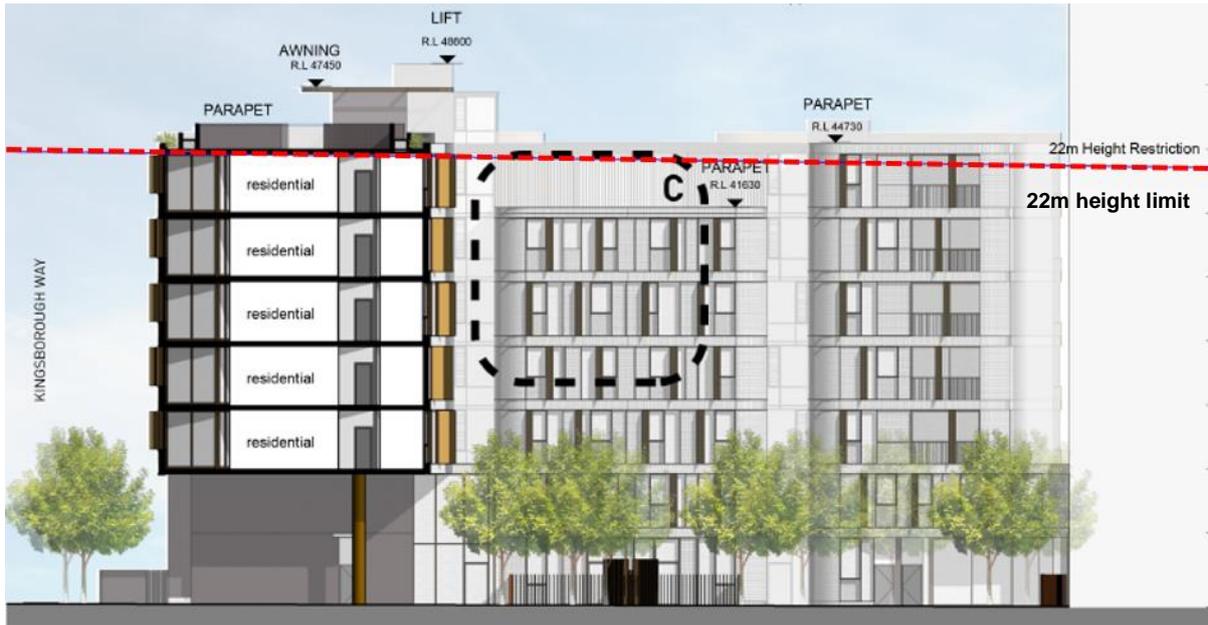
Section through Building B - 22m height limit illustrated by red dashed lines
